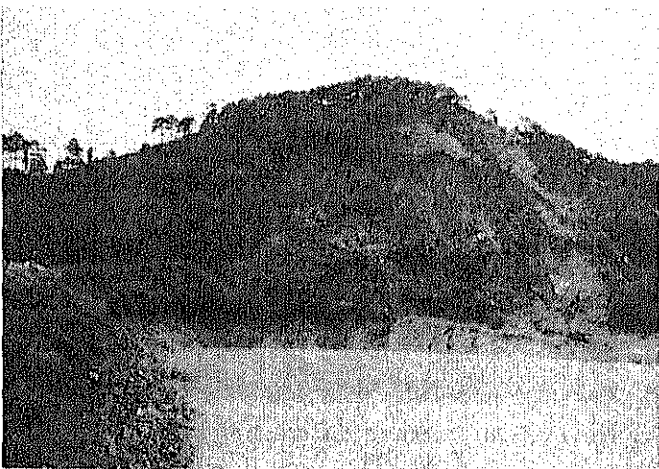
Sliding of the right bank abutment of the Binga Dam
